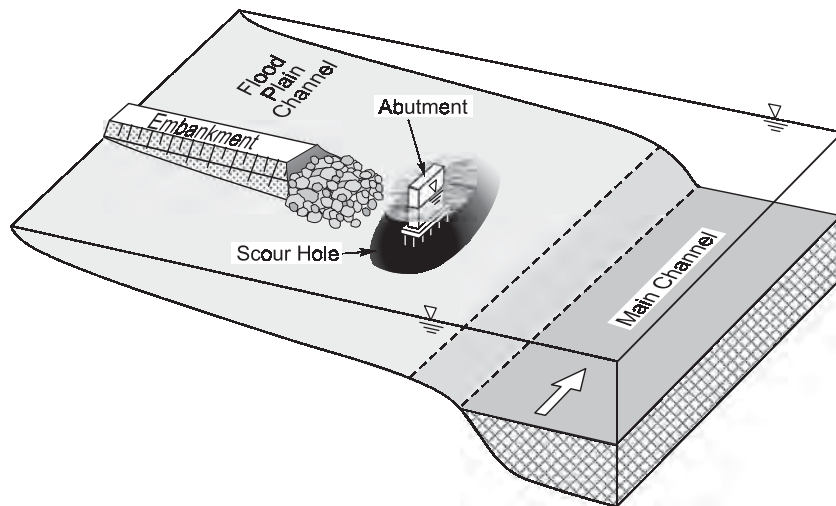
Washout of the approach embankment can fully expose the abutment foundation, such that further scour progresses as if the abutment were a form of pier.
